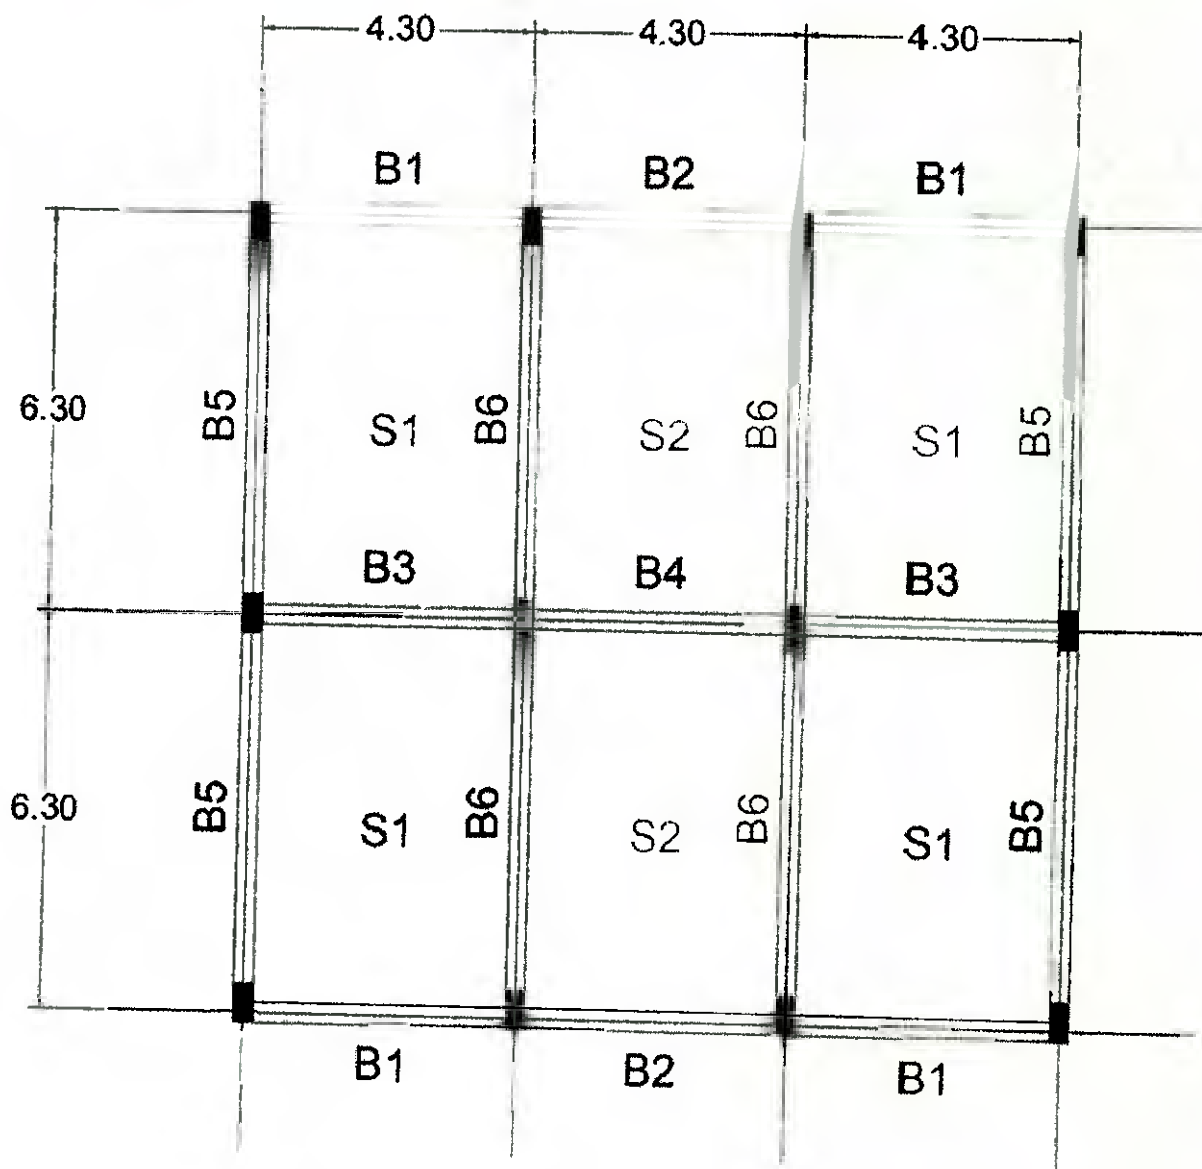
Plan of Flooring System (Note that the beam width is 300 mm)
